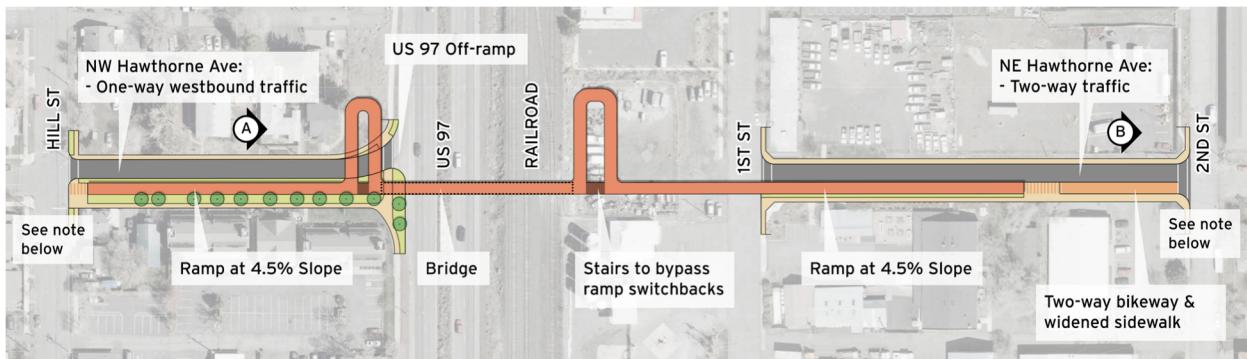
Hawthorne Avenue Concept 2A: Plan View
